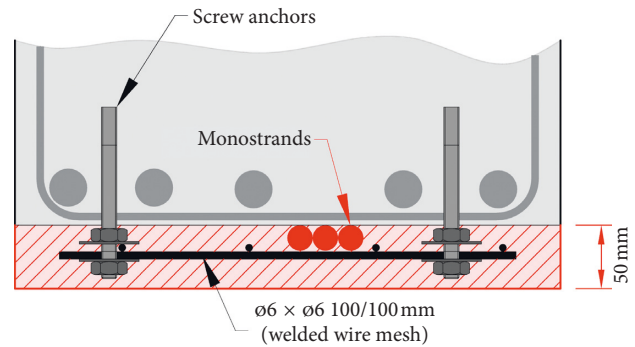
The arrangement of additionally anchored protective concrete covering layer (secondary corrosion protection of monostrands).
